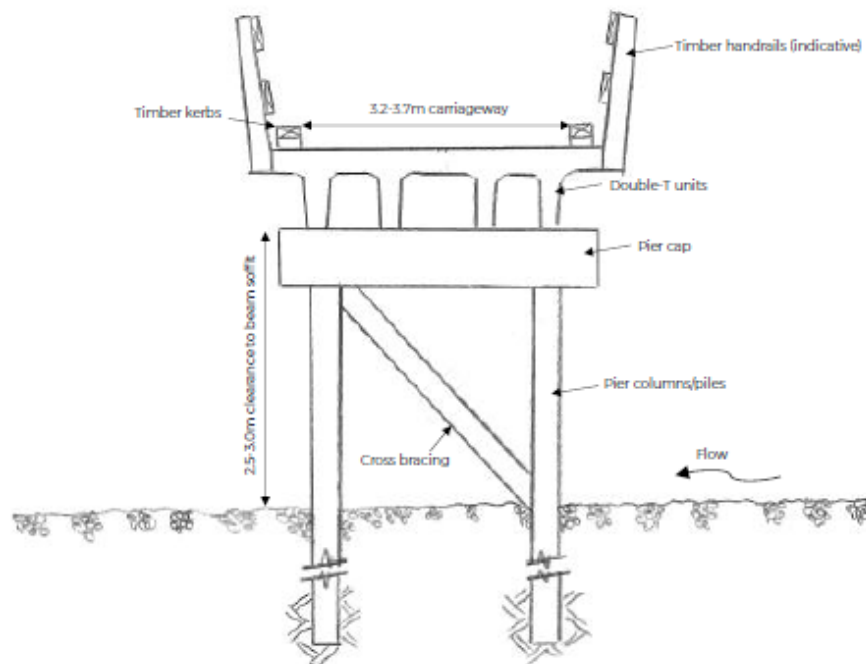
Sketch Cross Section showing indicative Single Lane Bridge details (at midspan)
